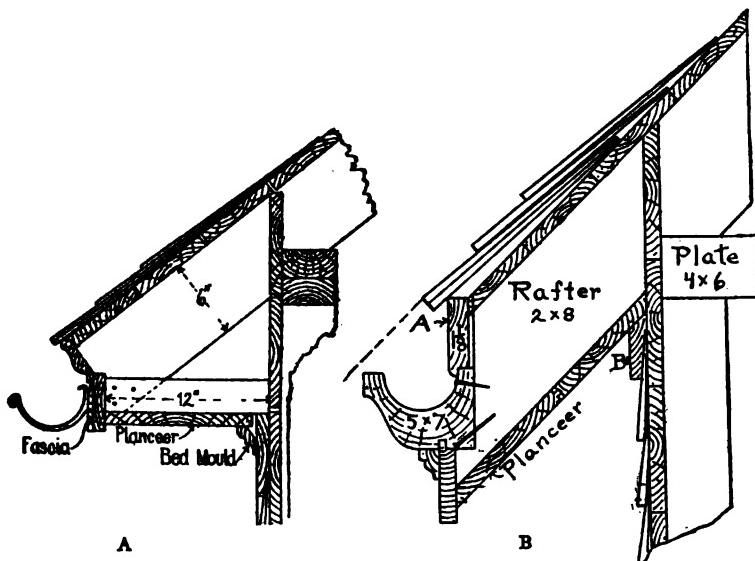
A, Eave-Trough. B, Wooden-Gutter, Boxed Rafters.
